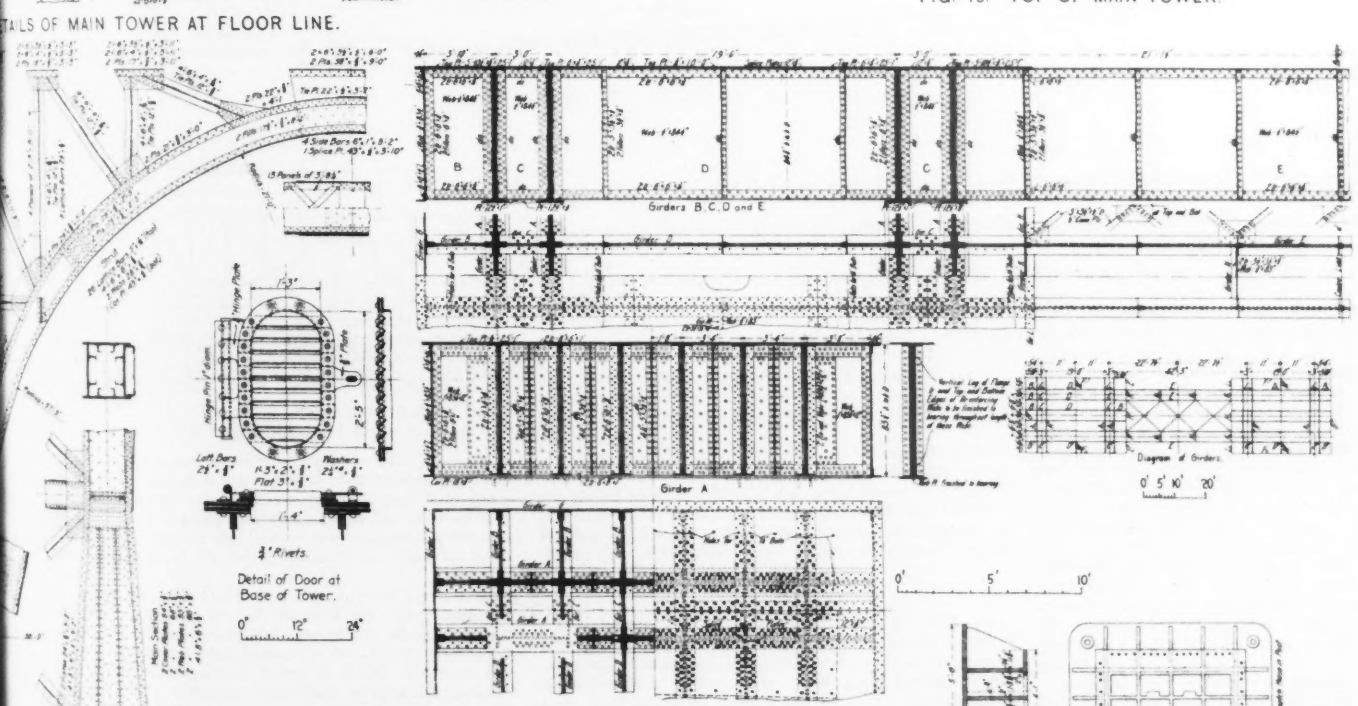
DETAILS OF GIRDER CONSTRUCTION AT TOPS OF MAIN TOWERS.
